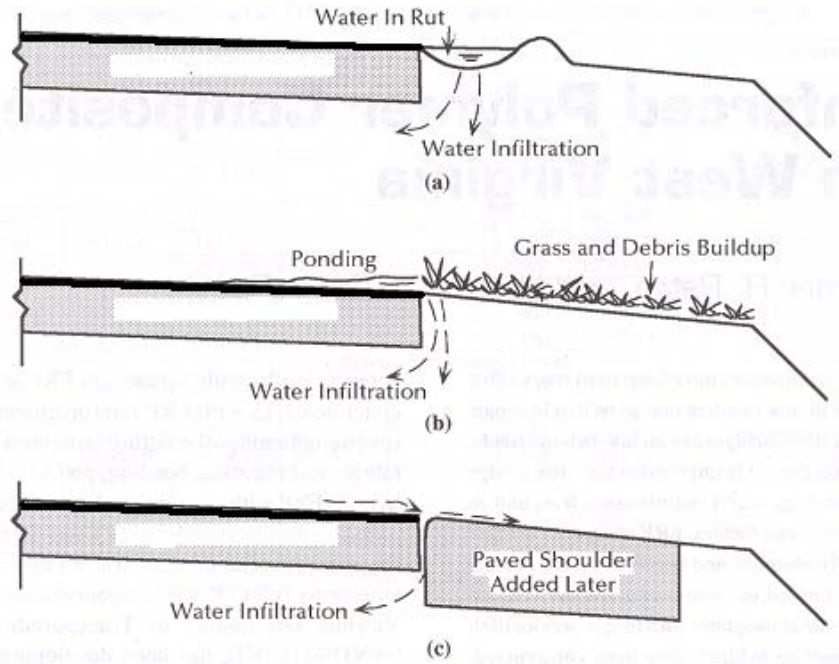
Typical drainage deficiencies associated with pavement shoulder construction¹³
